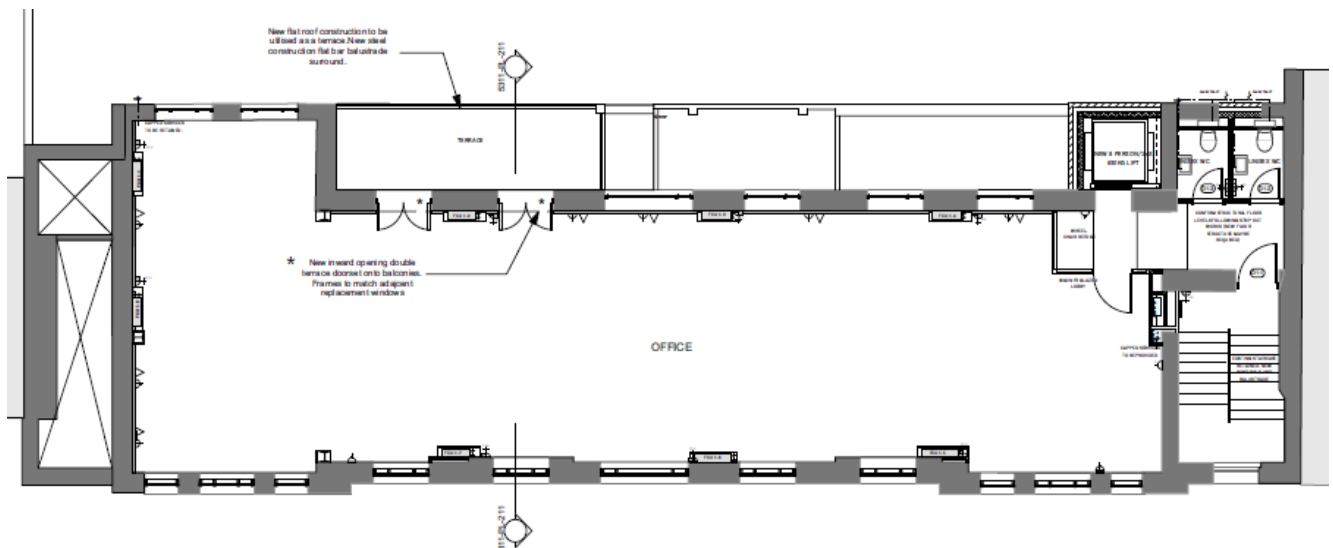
Proposed first floor plan showing proposed terrace. Terrace to be level with rear wing.
